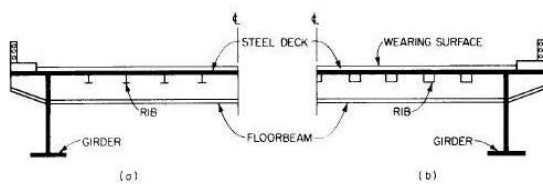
Cross-section of an orthotropic bridge deck. (CivilEngineeringX, 2023)
